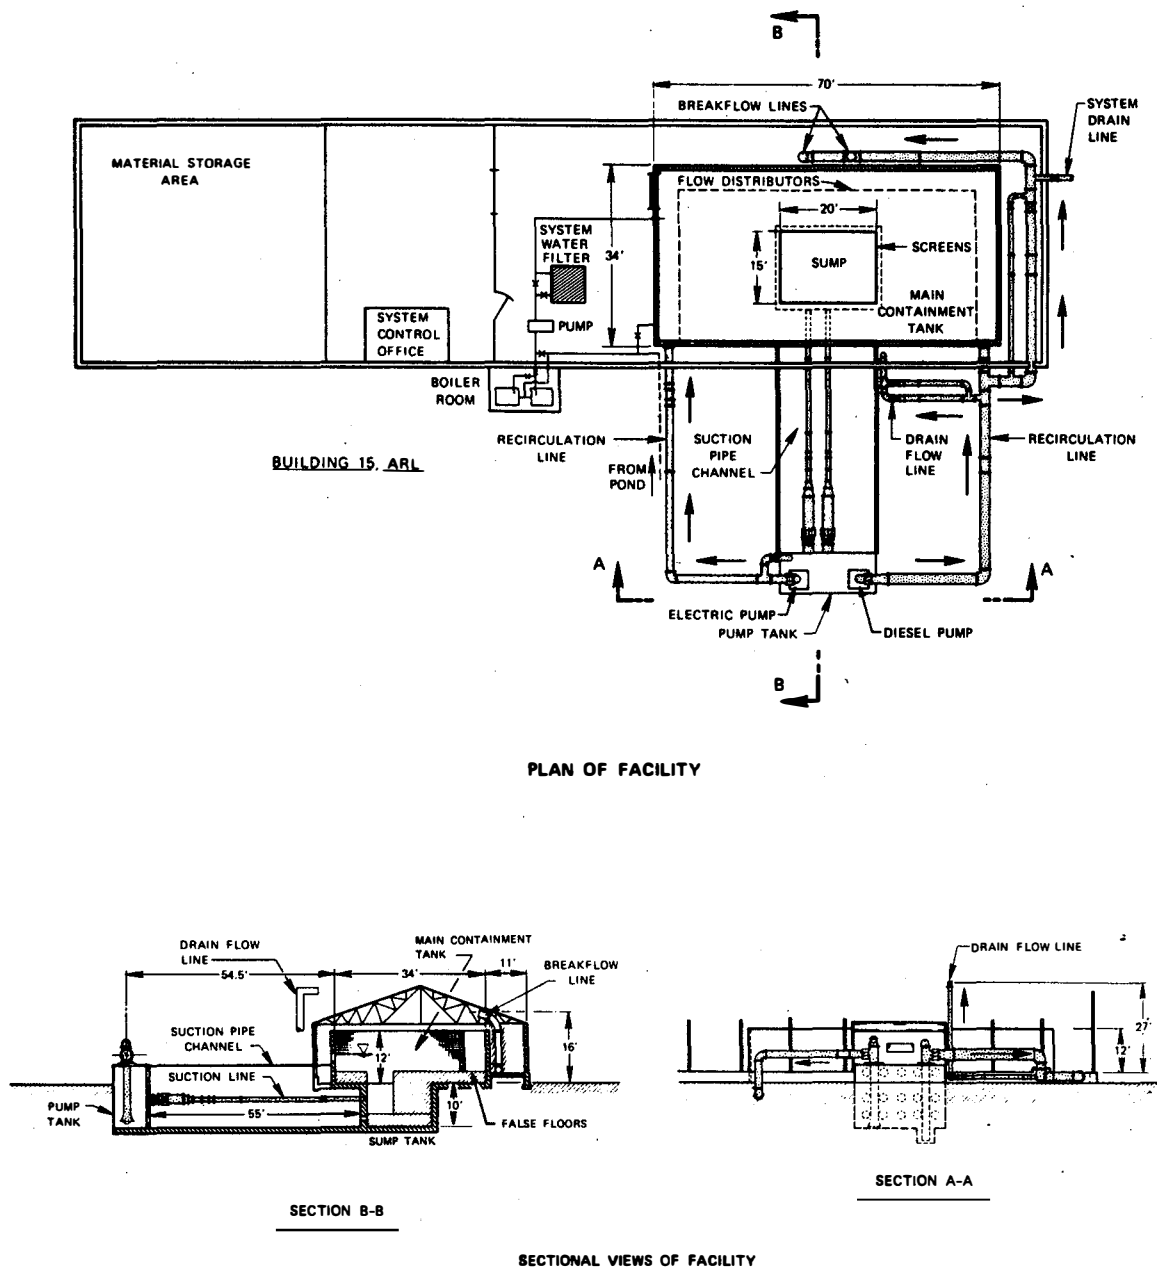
Plan and sectional view of the full-scale ECCS test facility
